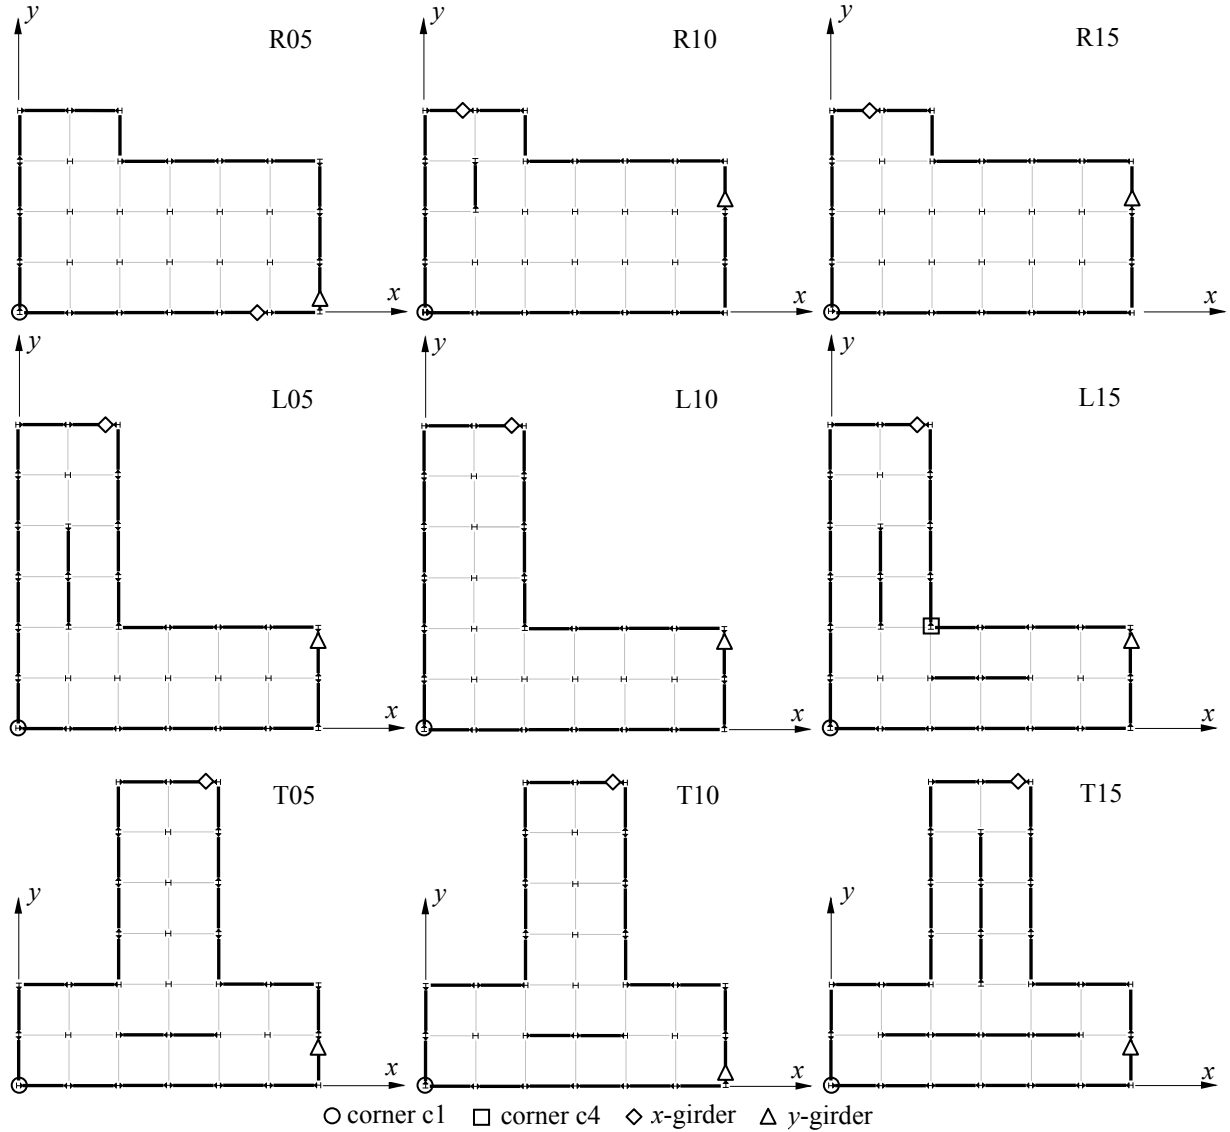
Plan views of the selected nine unsymmetric plan buildings.
